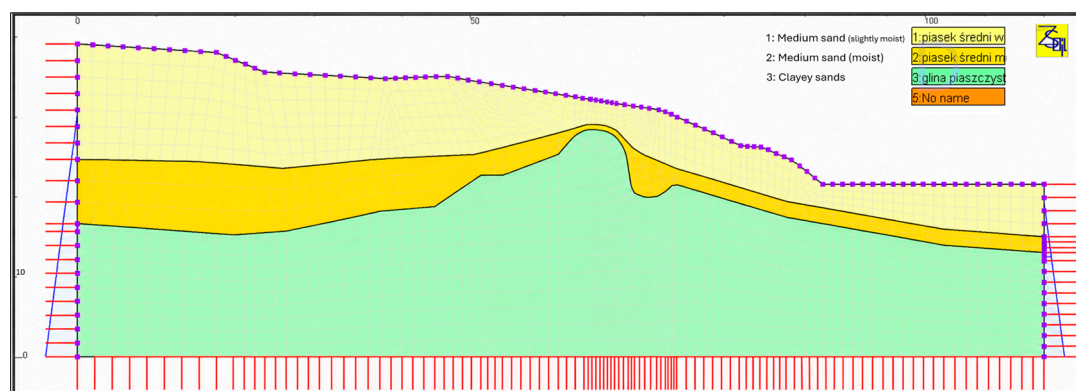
Cross-section of the derivation-channel embankment with soil layers and ground-surface elevations.
